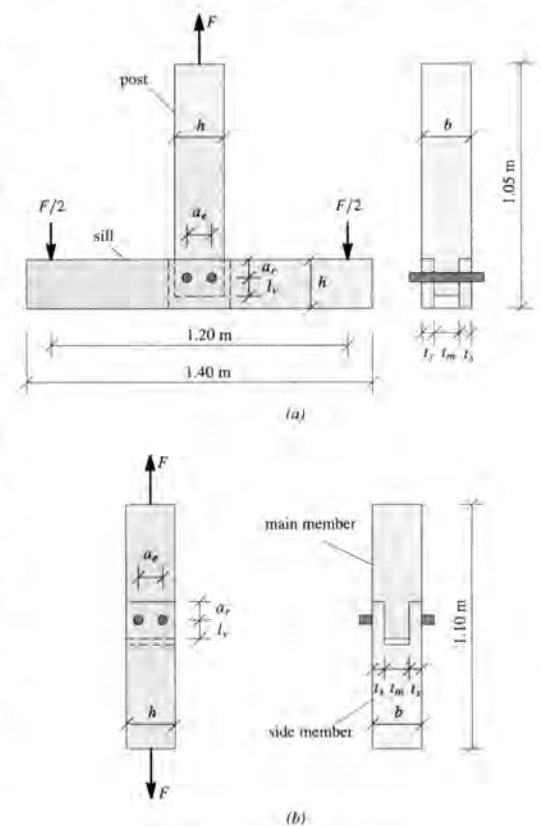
TEST SPECIMENS, DIMENSIONS IN METERS
